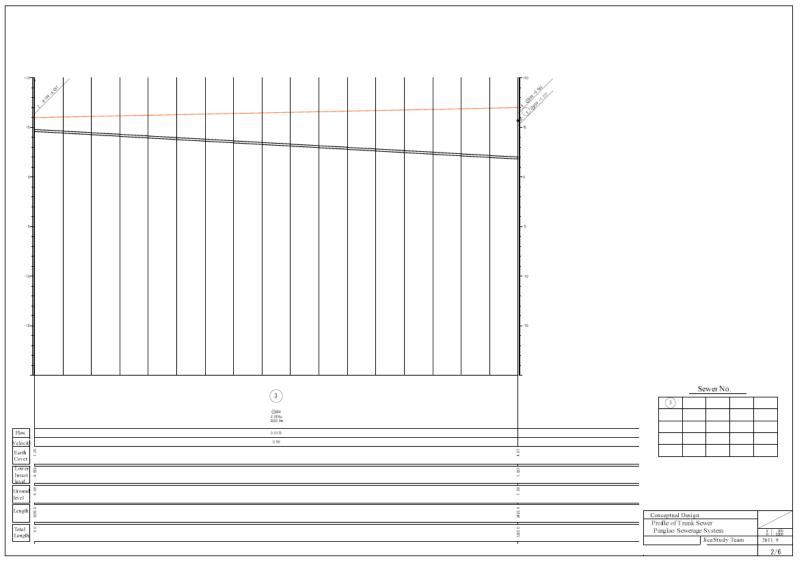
Profile of Trunk Sewer (Panglao Sewerage System)
